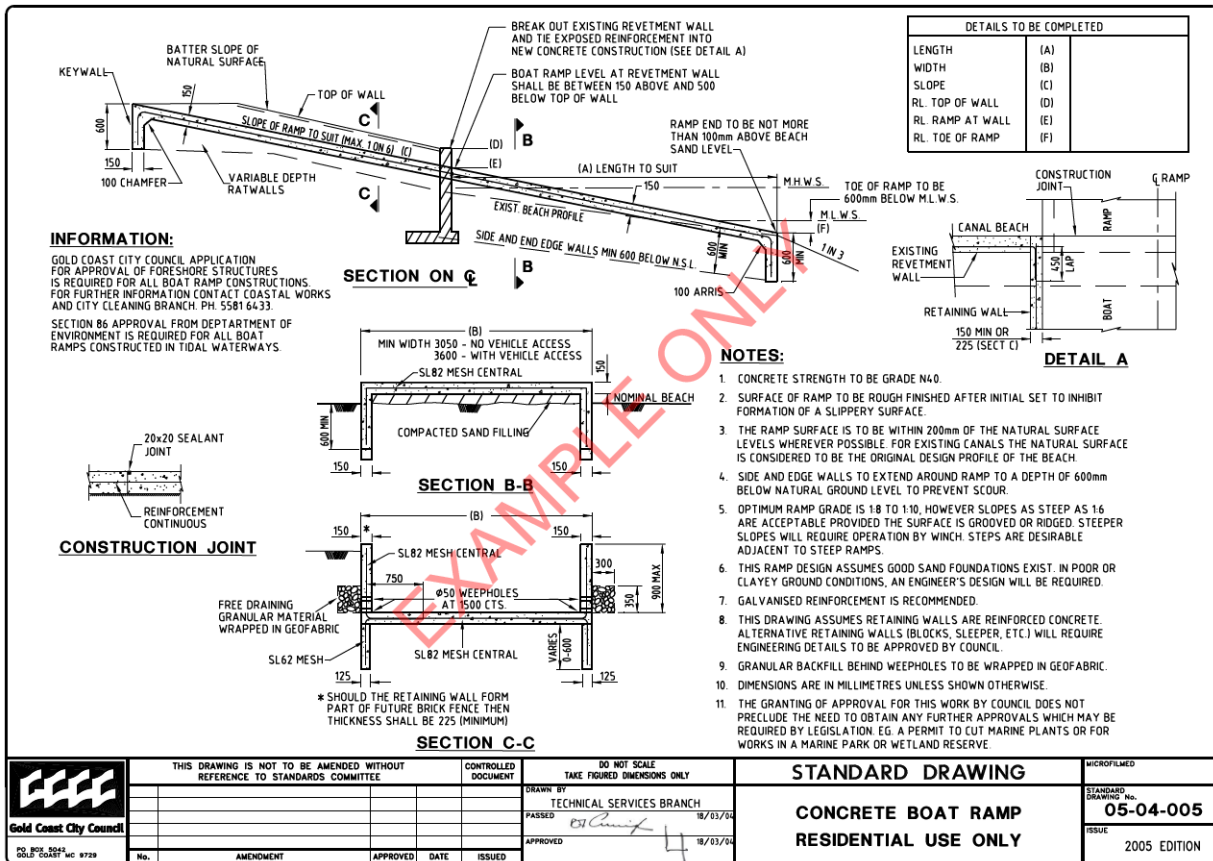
Example of site and layout plan for boat ramp. Please refer to City of Gold Coast's website for latest version.
